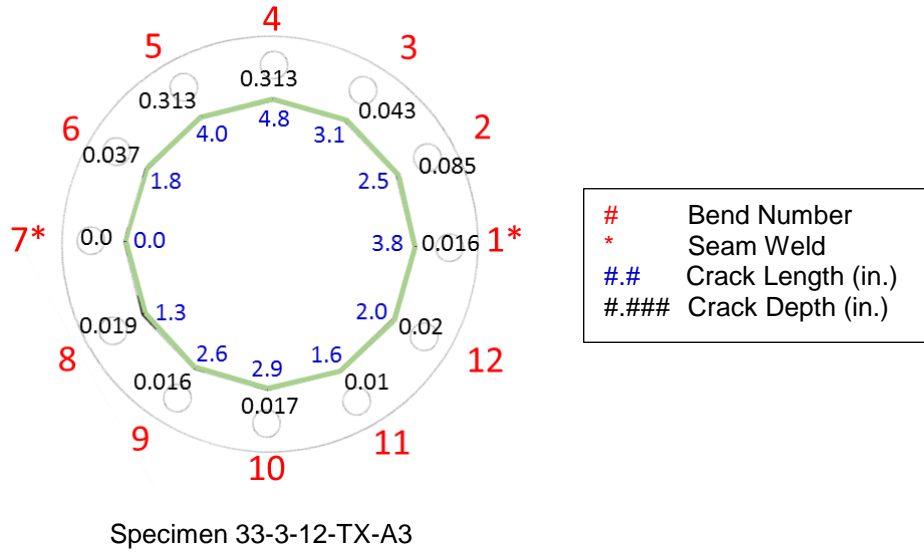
Specimen 33-3-12-TX-A3: Cracks after 1.7 Million Fatigue Cycles in Test 3
